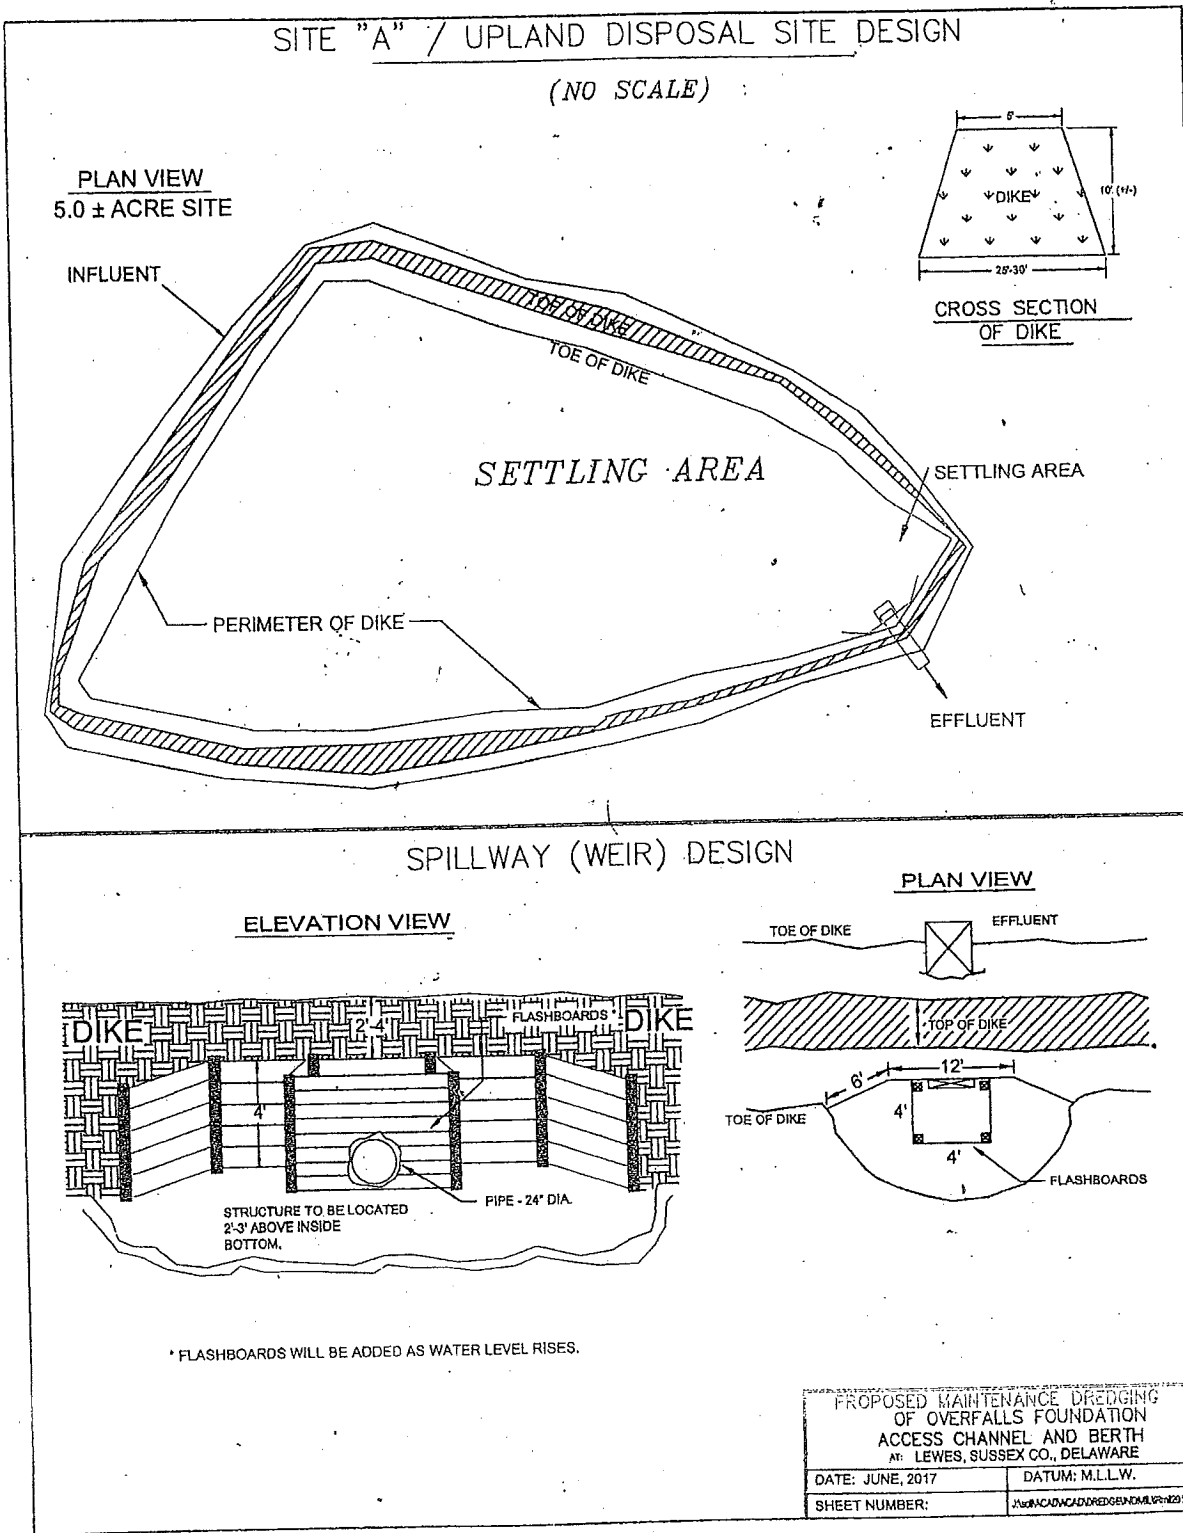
Confined upland disposal site plan and cross-section (provided by Chuck Williams, Shoreline and Waterway Management Section, DNREC).
